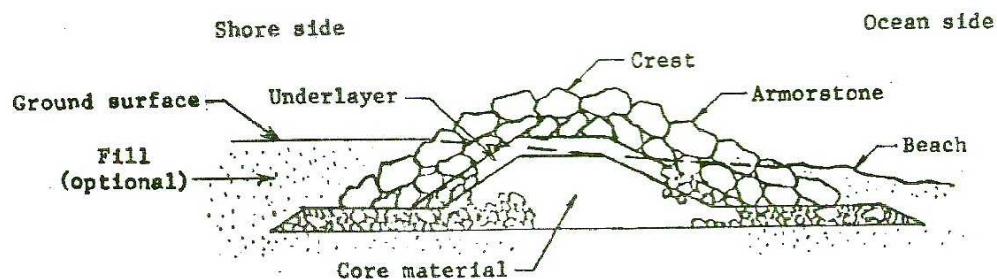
Rubble-mound seawall (U.S. Army Corps of Engineers, 1981)
